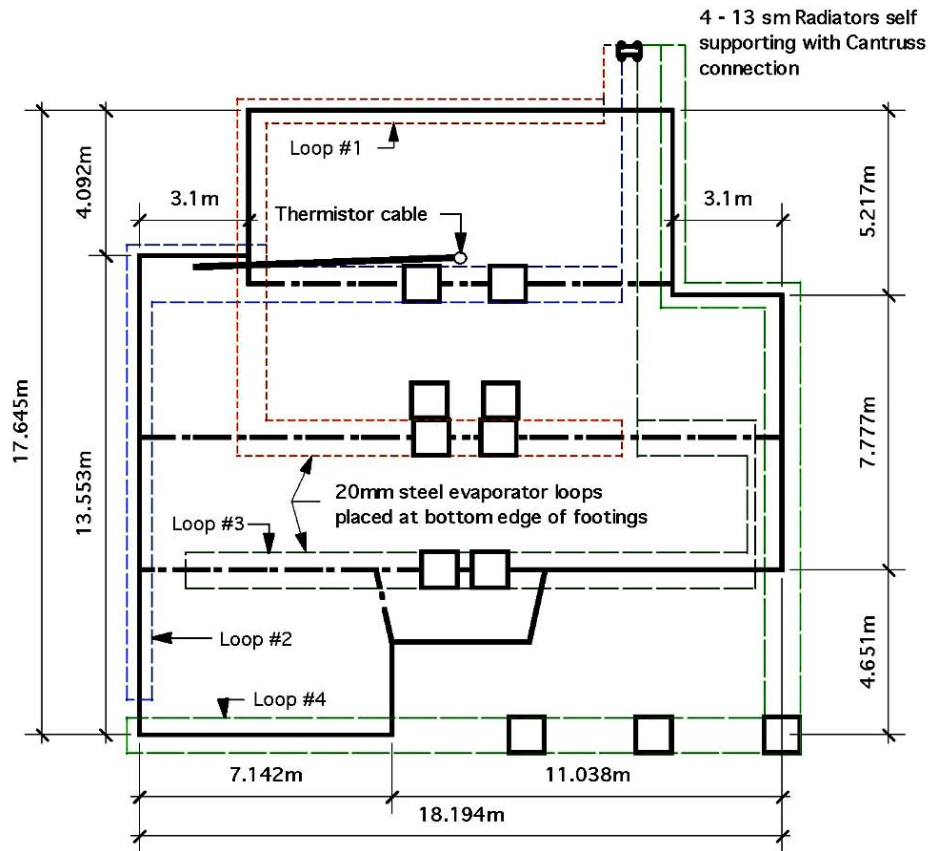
Plan showing footings and evaporator pipes at Visitor Centre, Inuvik, NT
